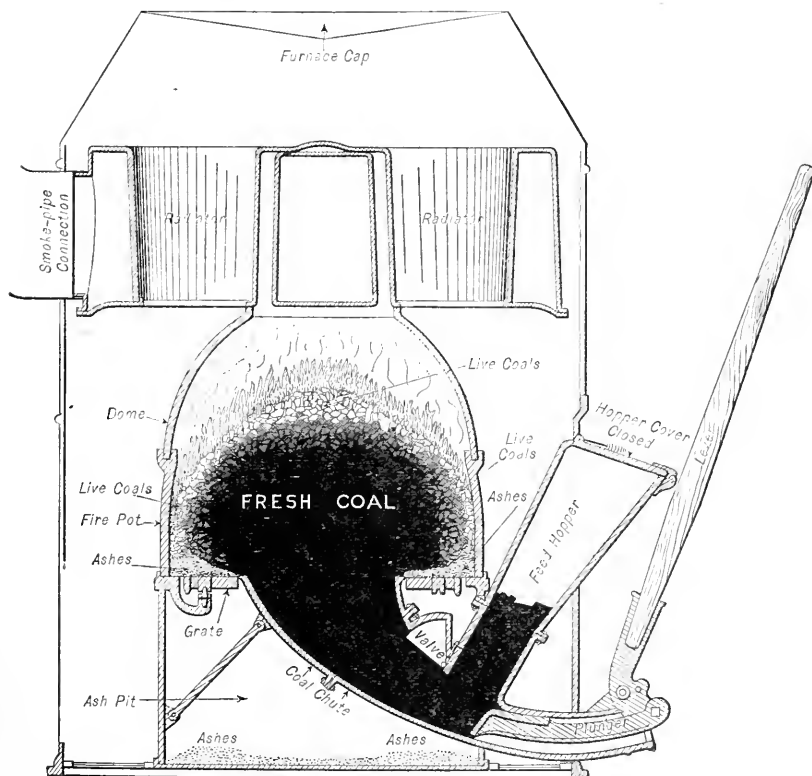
SECTIONAL VIEW OF PECK-WILLIAMSON UNDERFEED FURNACE.
